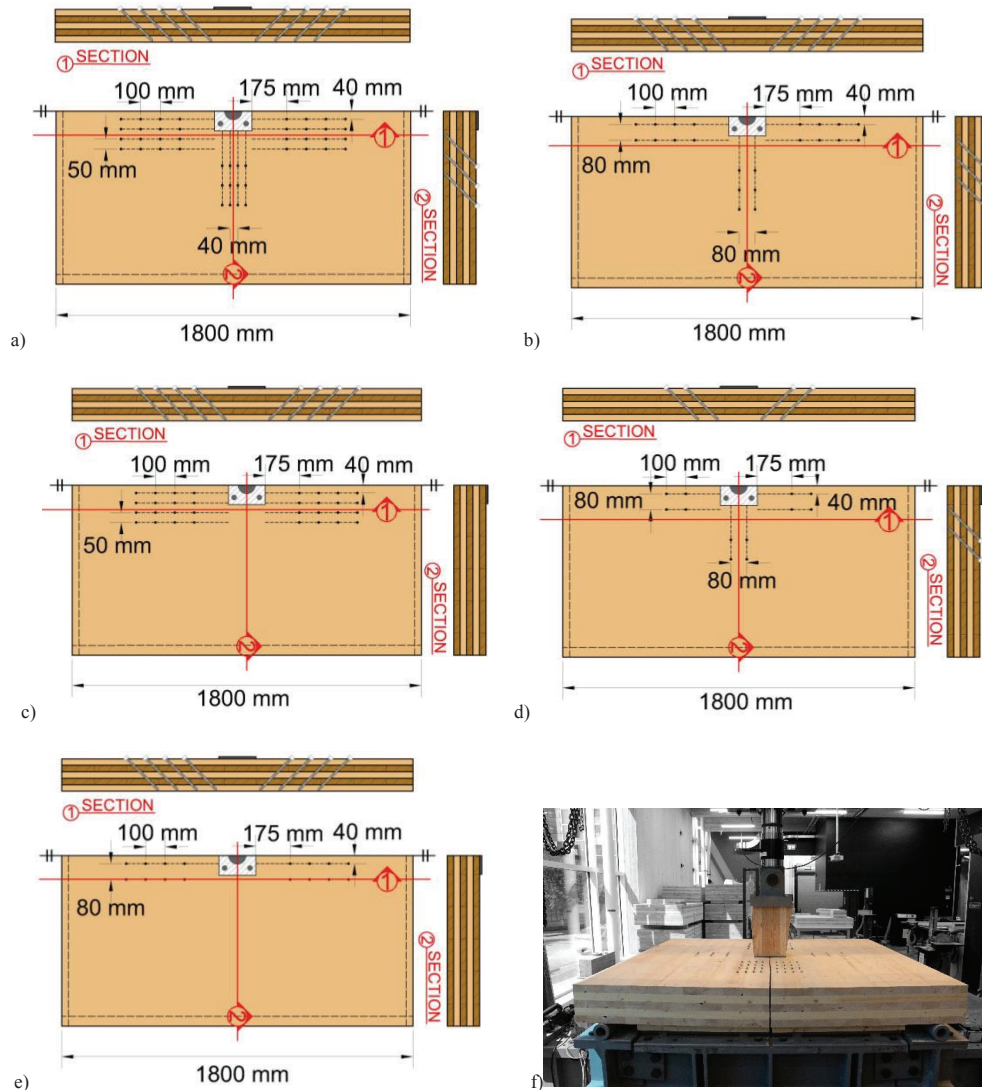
STS shear reinforced series: a) type 1 (S18); b) type 2 (S19); c) type 3 (S20); d) type 4 (S21); e) type 5 (S22); and f) type 1 exemplary photo.
